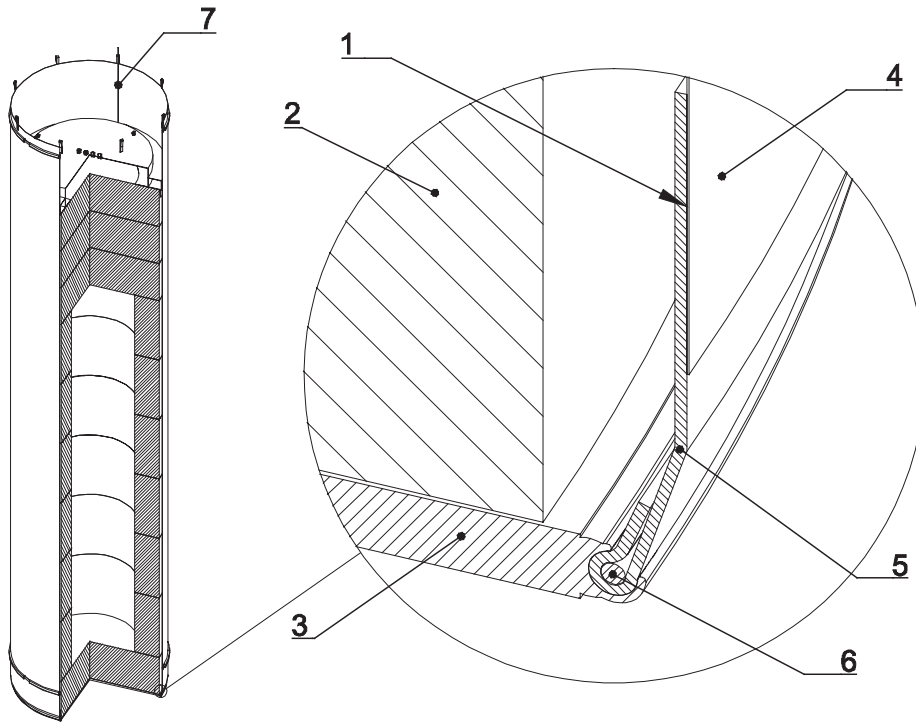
View of lower part of sheet where a rubber seal is glued to the sheet: 1) Polyurethane polymer glue. 2) Buffer block. 3) Bottom plate. 4) Protective sheet. 5) Rubber Seal. 6) Rubber O-ring. 7) O-ring extension.
